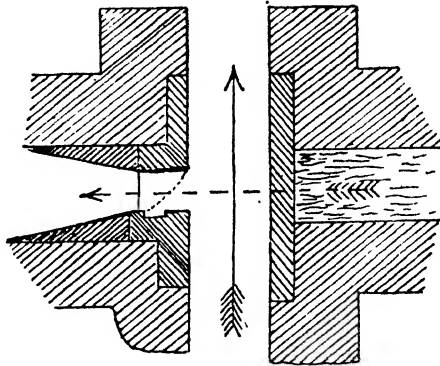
SPECIAL FORM OF AIR-CROSSING, IN PLAN.
